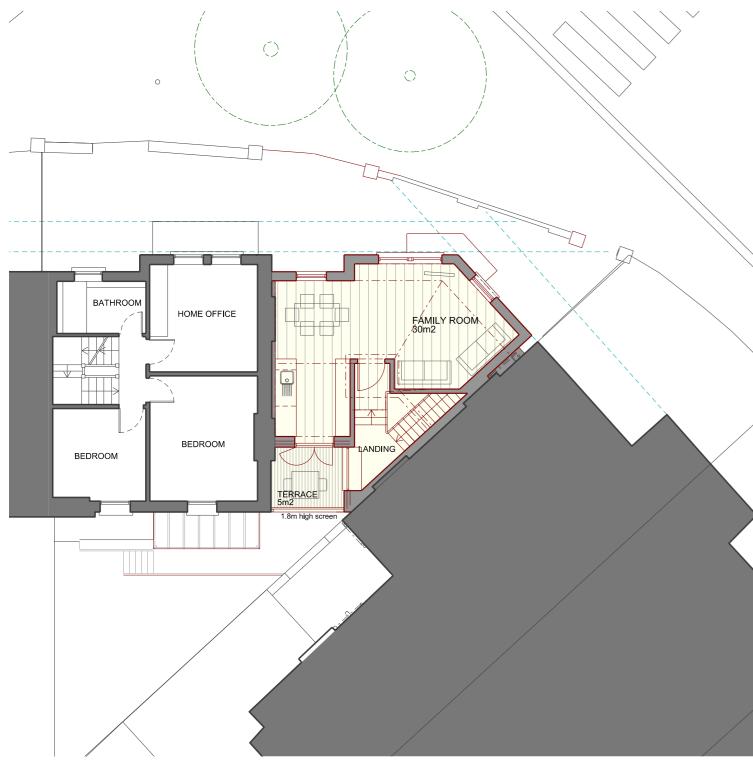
Proposed first floor plan, submitted for pre-application advice. Now superseded.
